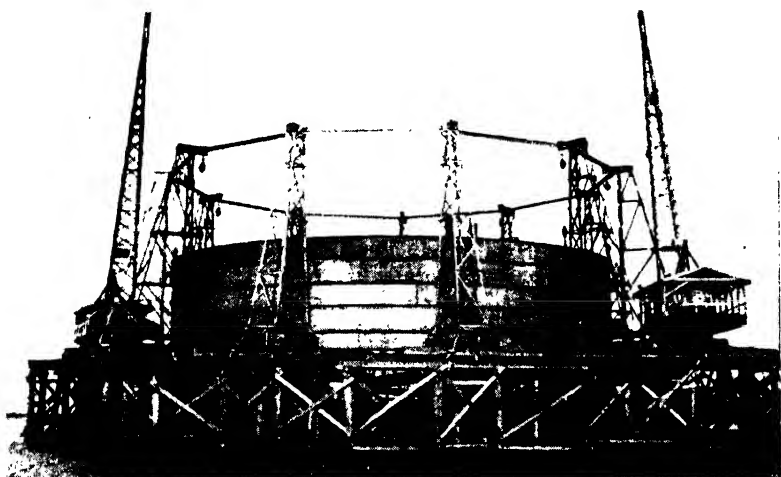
Steel shell being lowered into place to provide sand island for construction of bridge pier.
